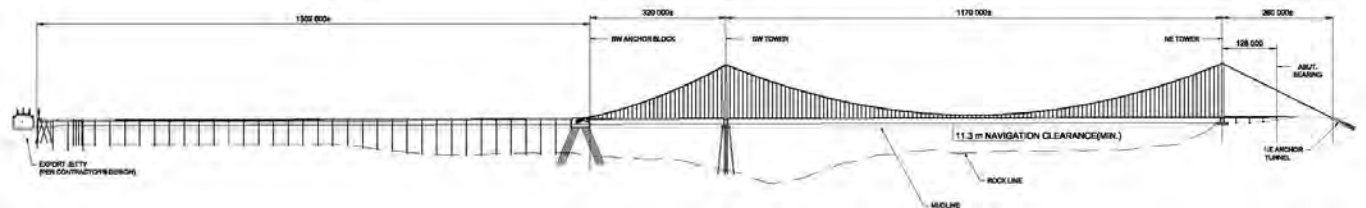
Elevation Drawing of the Proposed Marine Structures
